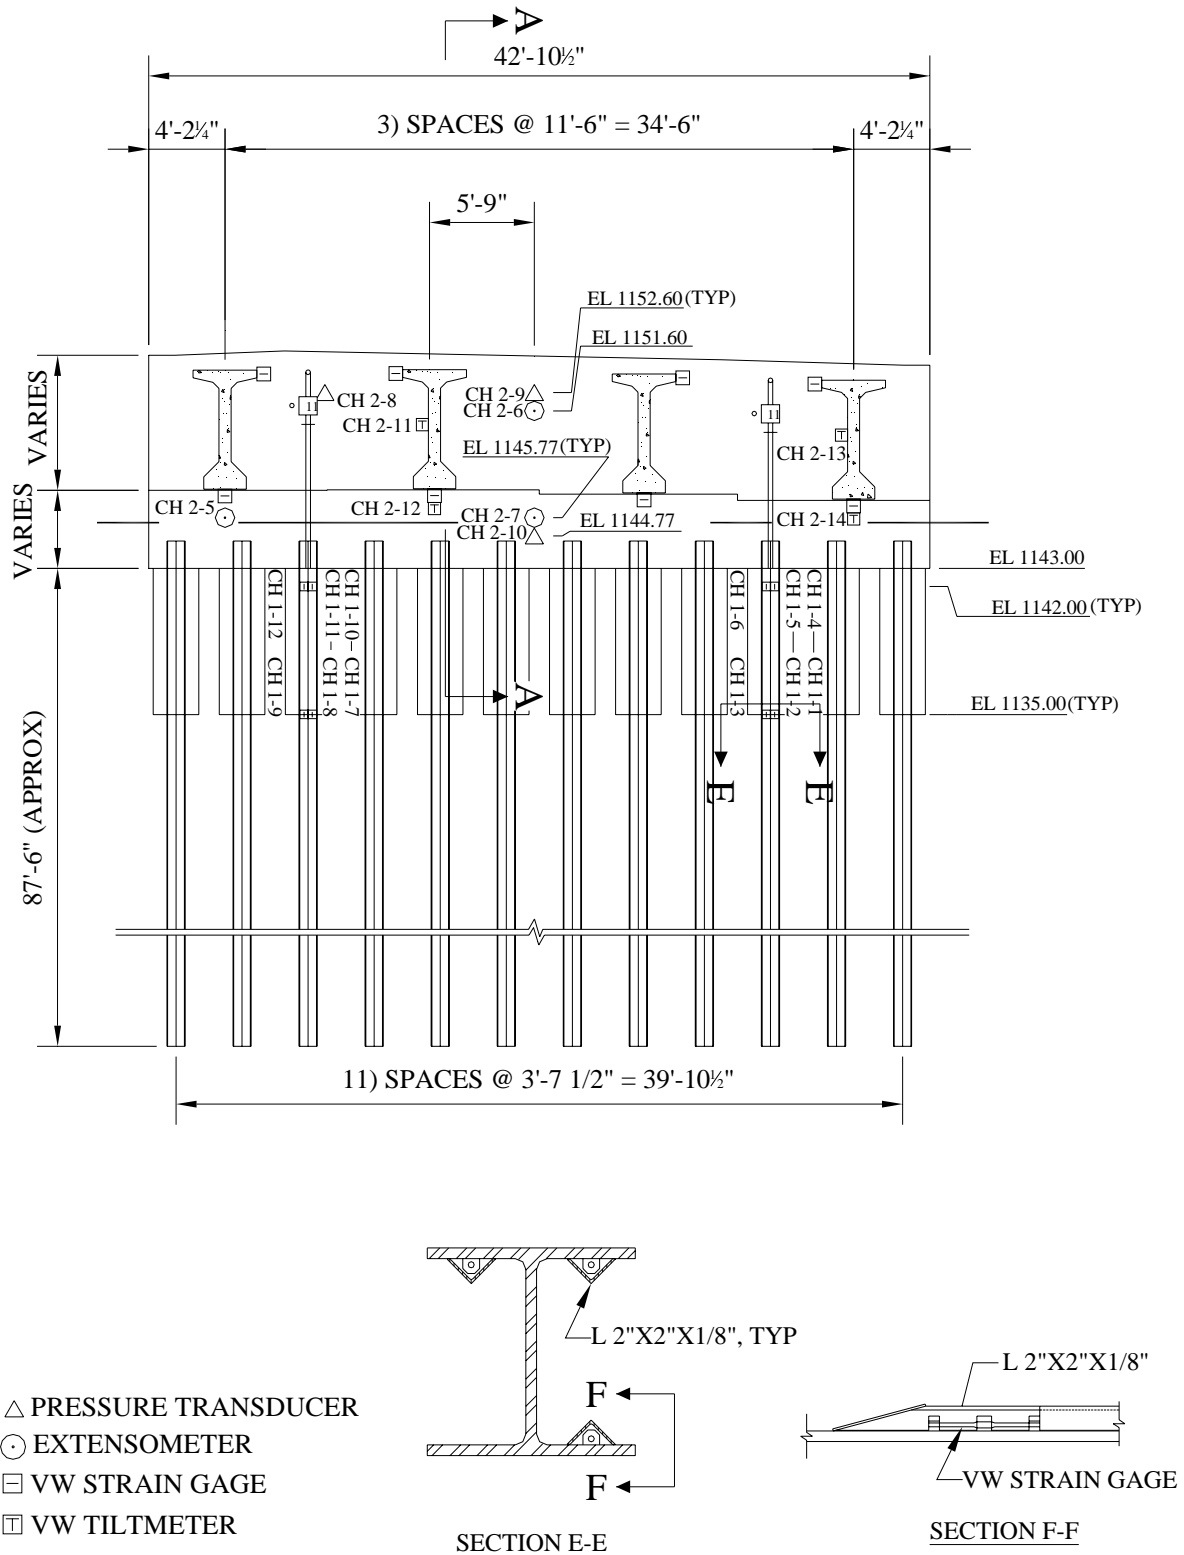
Bridge 109 Abutment 2 Elevation (Section B-B).
